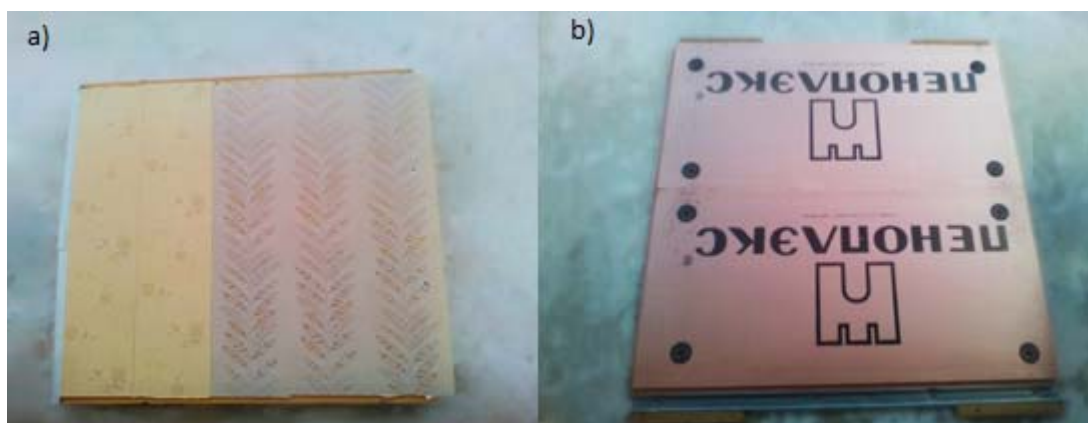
Model of the ventilated facade: a - with facing; b - without facing.
